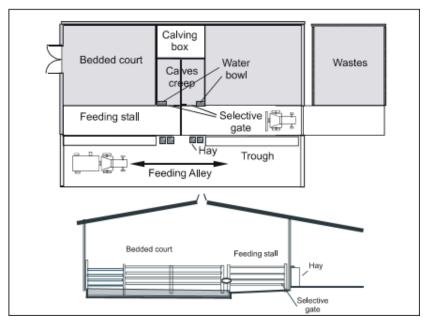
Arrangement and cross-section of a free-standing building, with a brace for the calves and a courtyard with concrete floor. (Brigitta KRIMBERGER. 2004)
